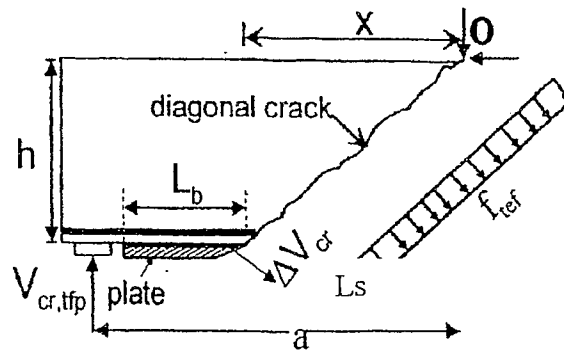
Forces in cracked steel plated beams (Ali et al. 2001).
